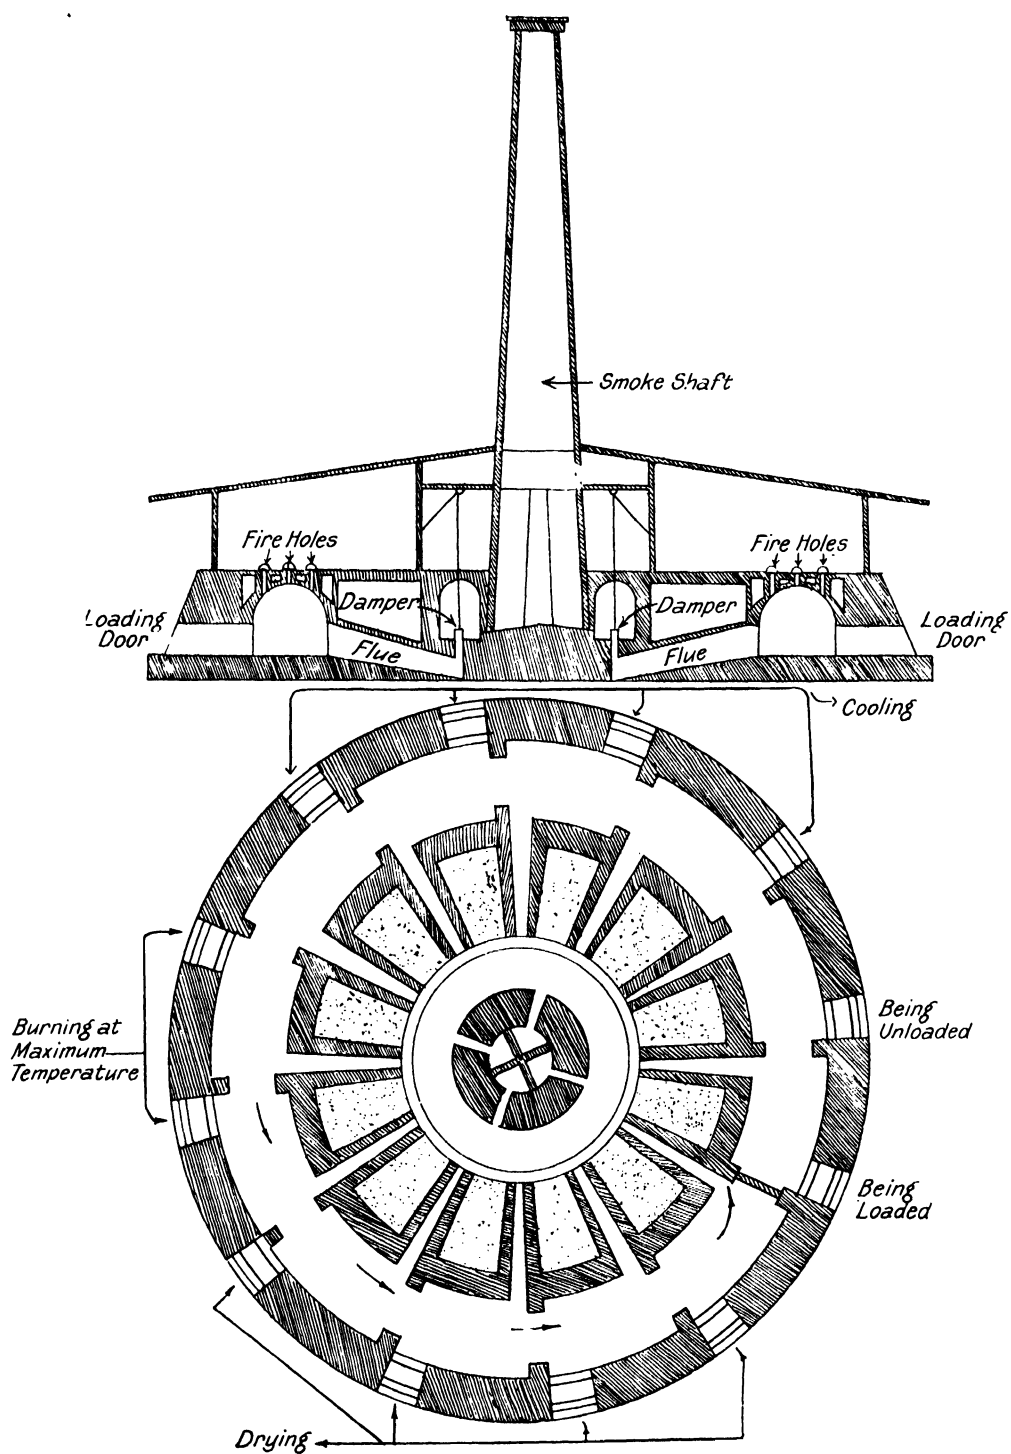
SECTIONAL ELEVATION AND SECTIONAL PLAN OF HOFFMANN KILN
